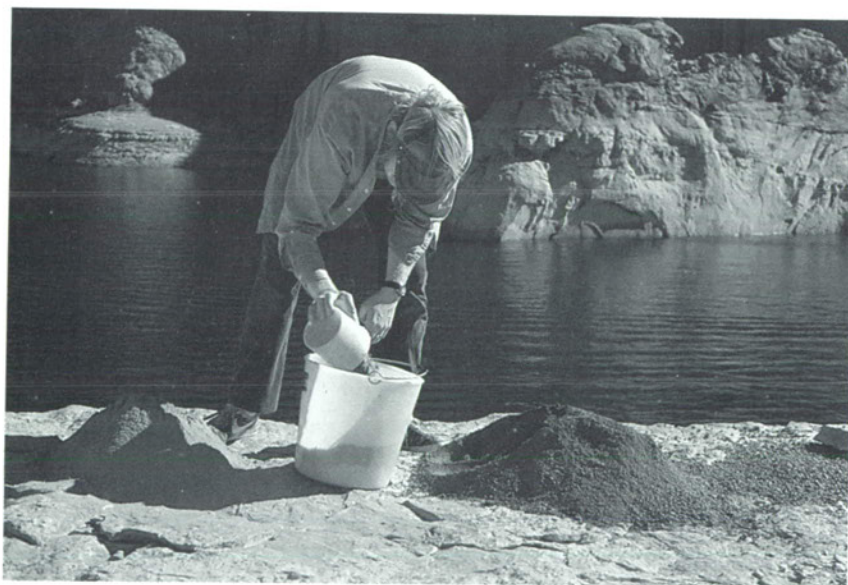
Mixing the screened sandy fill soil from the site with the clay imported from the Halls Crossing Marina in manufacturing an unamended mud mortar.
